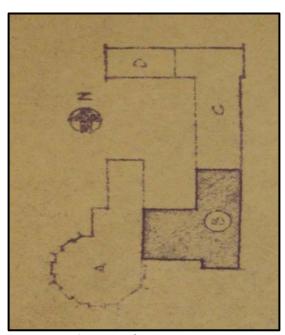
Key plan of the sections of the PHL. (Source: original building drawings, PHL archives)
